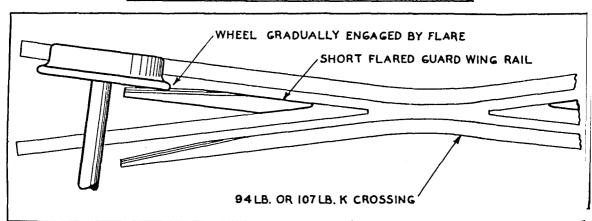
6. WHEEL SHOWN ENGAGING FLARED GUARD WING
